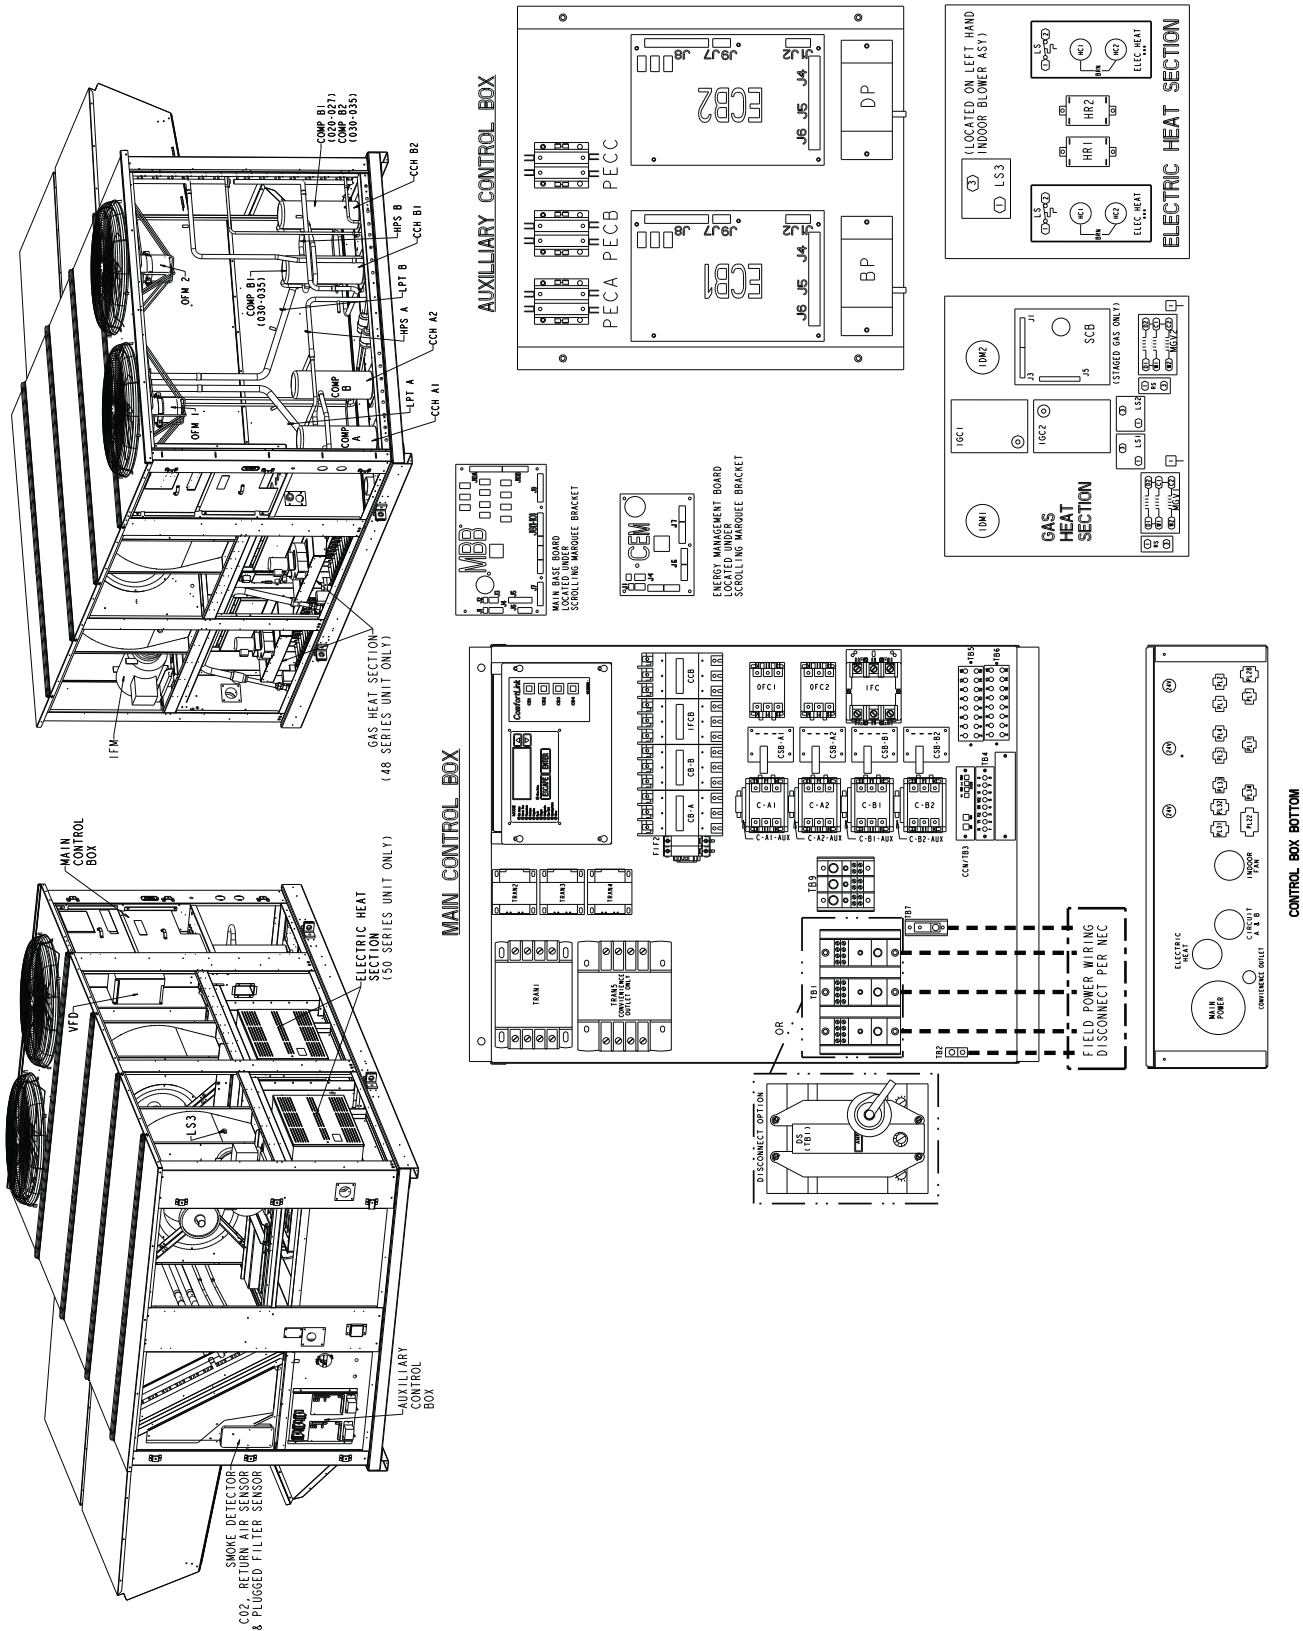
Small Chassis Component Location (Size 020-035 Units)
